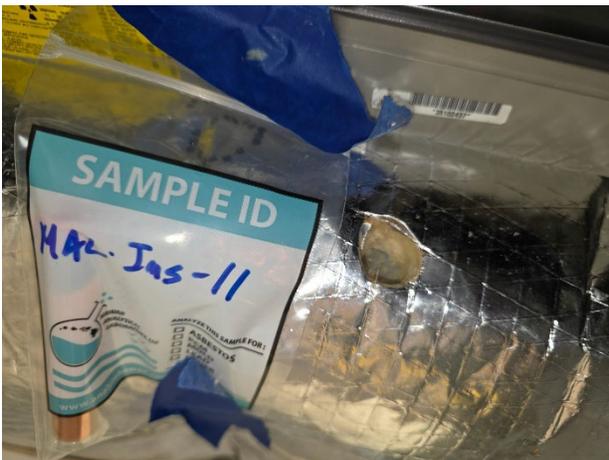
Sample ID: MAL-Ins-11 Silver wrap and yellow insulation. Above Drop Ceiling. Recreation Room.
